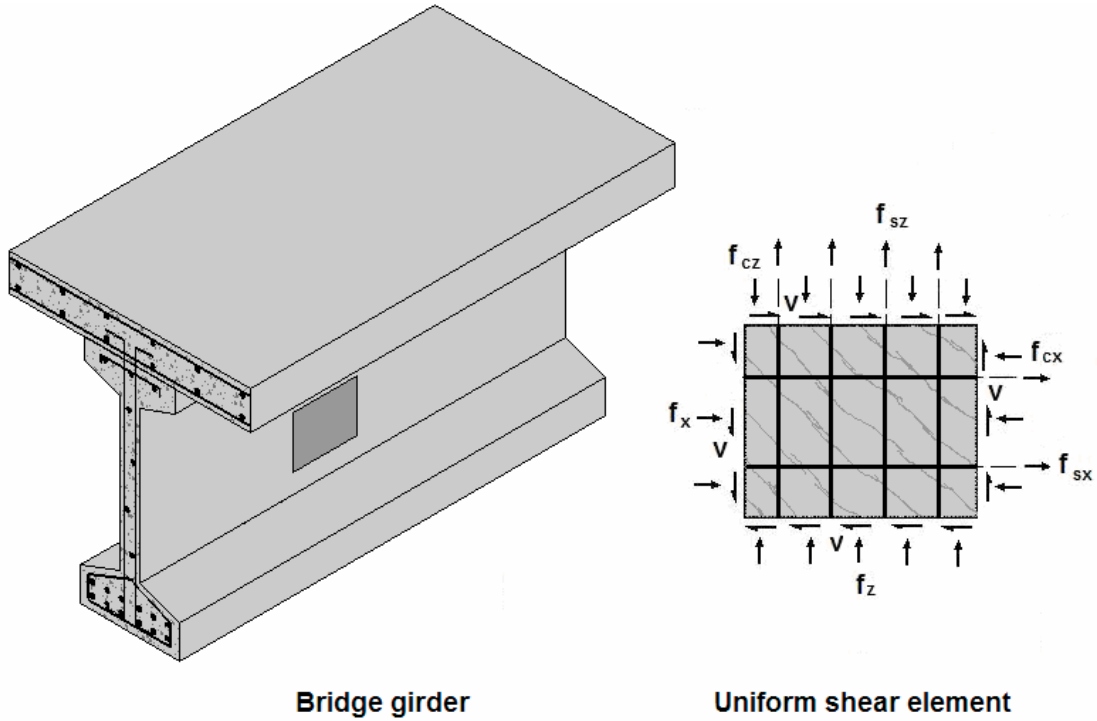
Element of reinforced concrete subjected to uniform shear and normal stresses.
